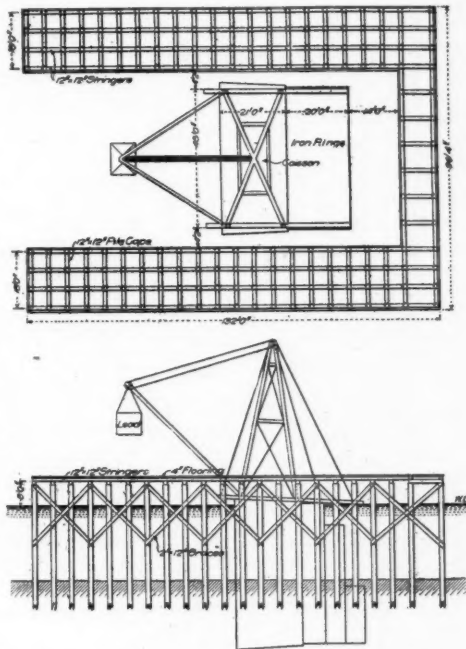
FIG. III.—OVERTURNED CAISSON WITH WHARF BUILT AROUND IT.
